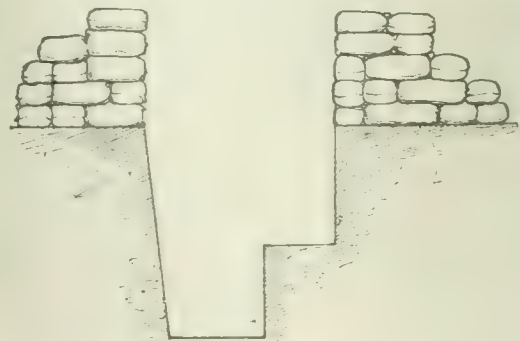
Diagram representing a section through a fire trench, measuring about 2 ft. at the bottom, about 4 ft. at the upper ground level, and about 6 ft. 6 in. from top to bottom. The shelf at the side, or fire-step, can be used as the foundation for a stretcher bed when the bottom of the trench is full of water.
